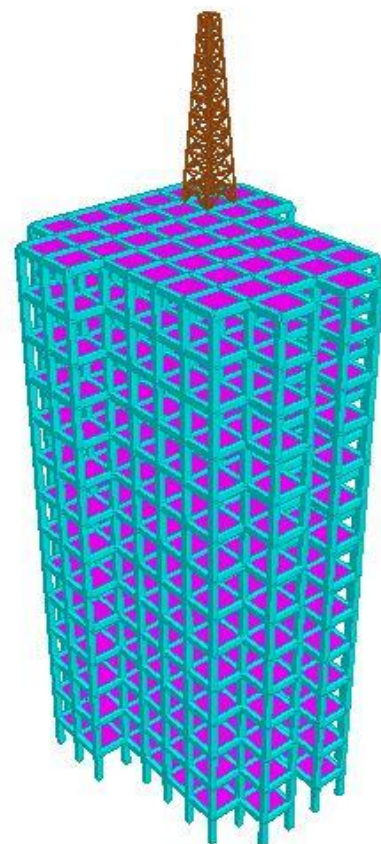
3D view of Telecommunication Tower over Roof of Multistorey Building
